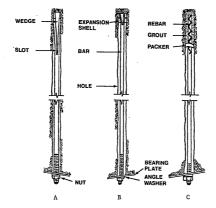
Three types of mechanical roof bolts. (A) Slot and wedge type; (B) Expansion shell type; (C) Grouted anchorage type (9).
